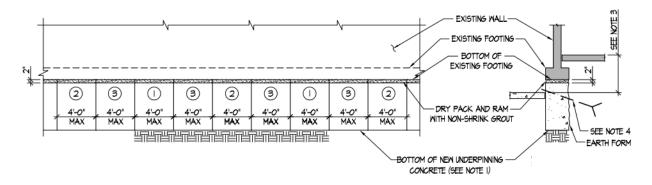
Section showing existing footing and new underpinning (right) and Elevation of sequence for underpinning: All units numbered 1 must be fully installed before excavating for placement of all units numbered 2, etc. (left), 6/S3.02
